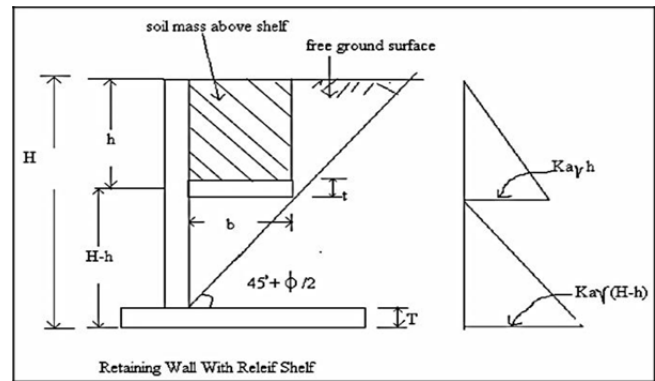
Cross section of counterfort retaining wall with one relief shelf and soil pressure variation
